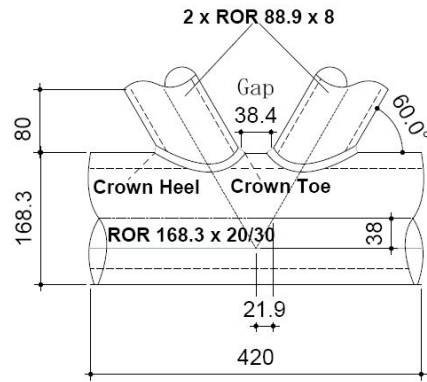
Schematic of the K shape welded joint (dimensions in mm).
